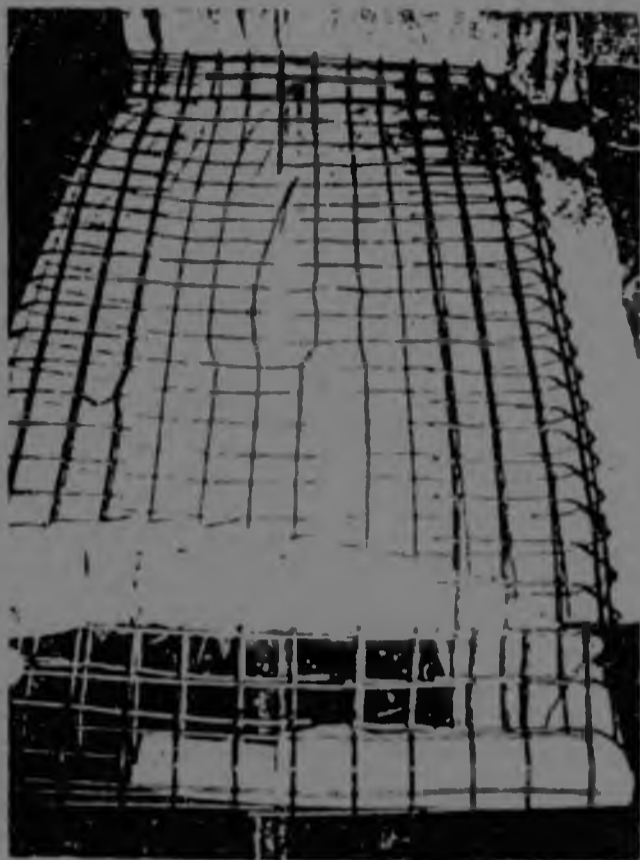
Appearance of a sheet of mesh reinforcing after test. Note the double tensile failure of the transverse reinforcing wires
